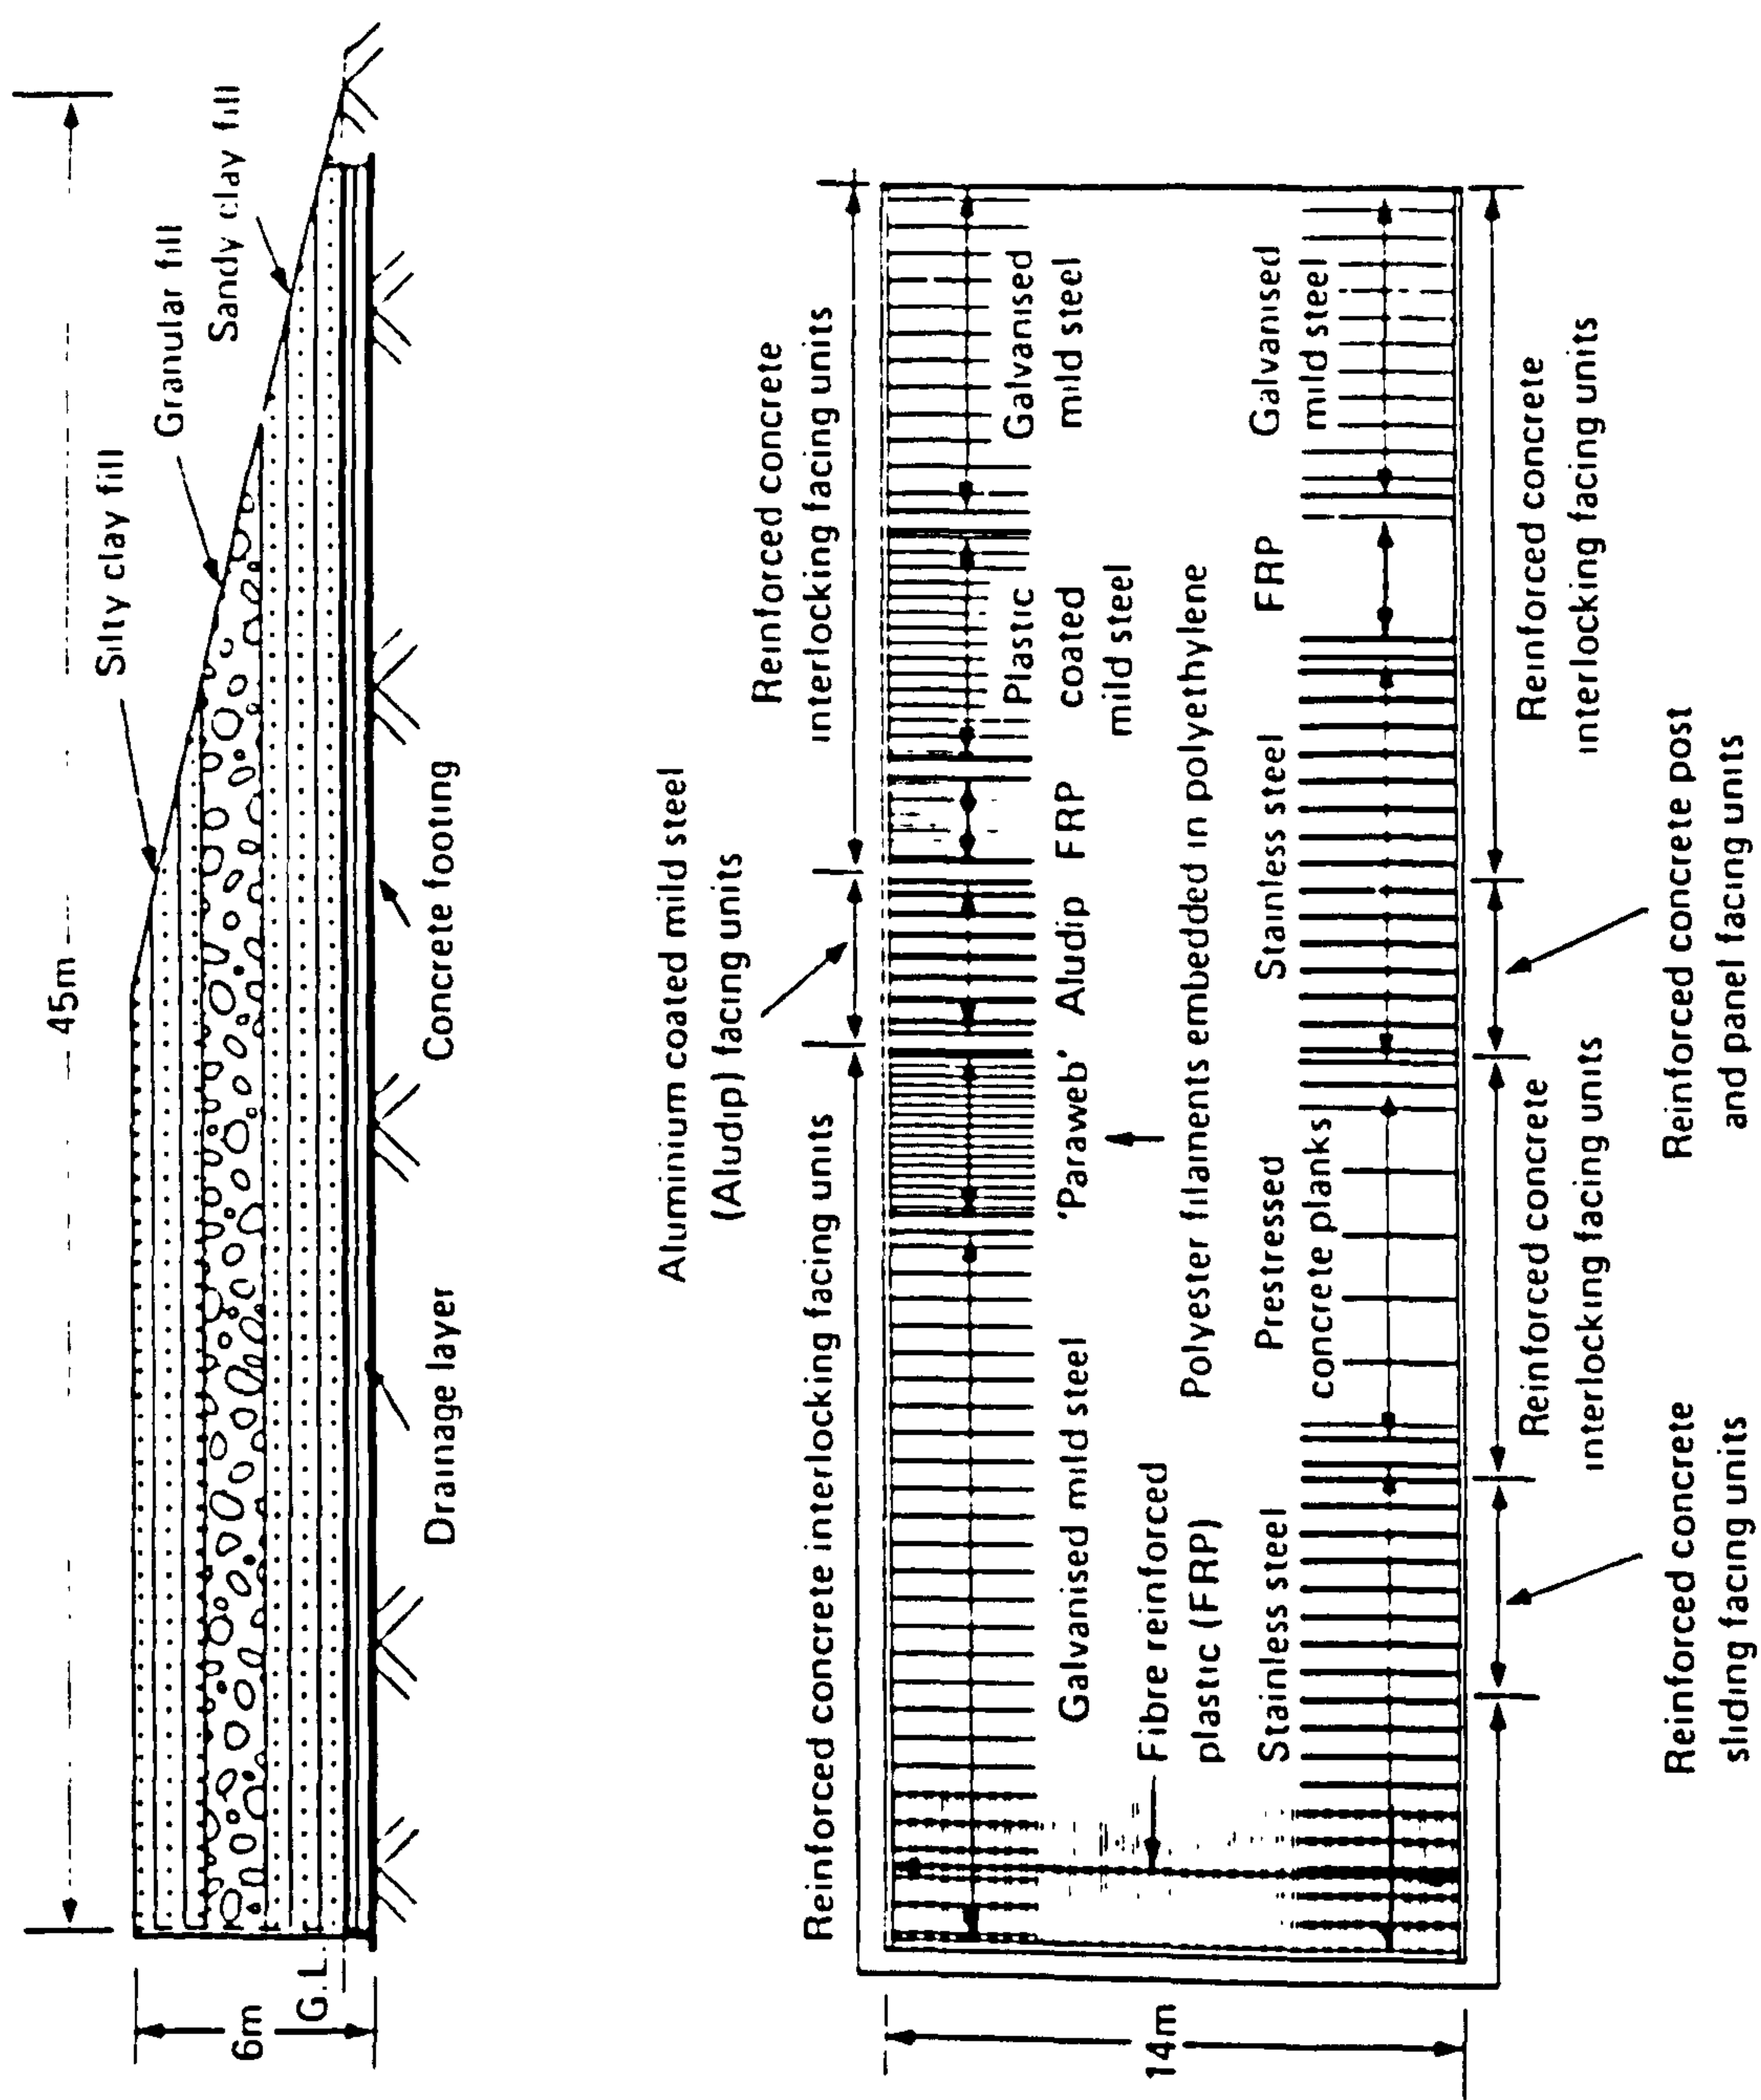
PLAN AND ELEVATION OF FULL SCALE TEST OF REINFORCED EARTH WALL (AFTER BODEN ET AL., 1978).
